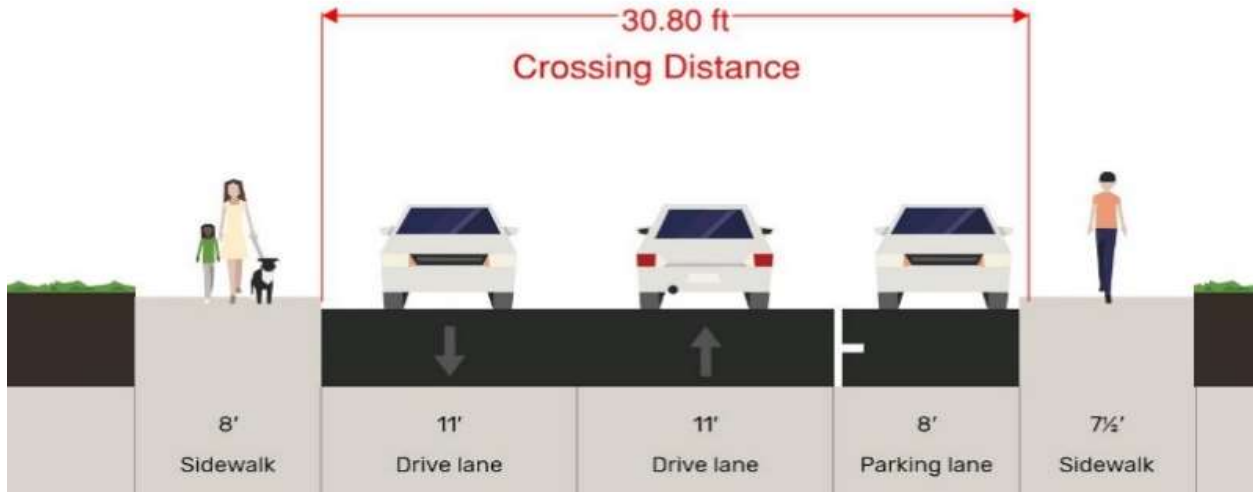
Typical Section - Existing Condition between Western Way and Hartley Avenue (Southbound direction)
